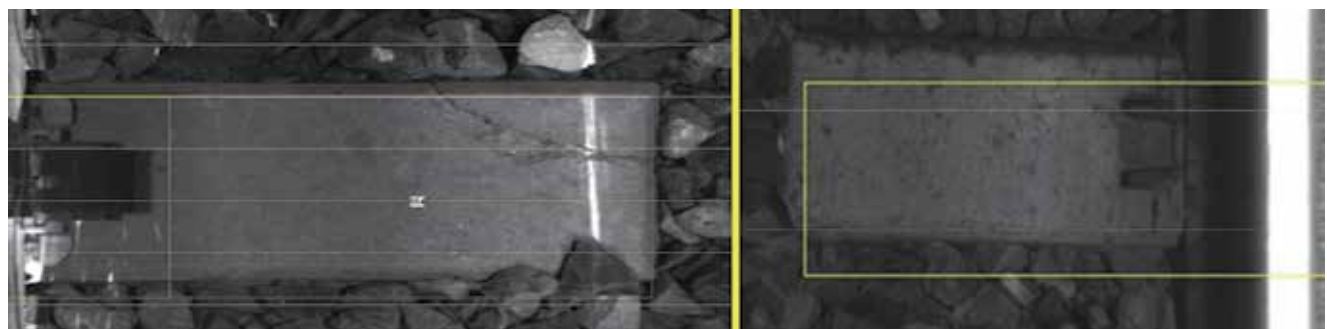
Track surface inspection system – cracked sleeper (left), missing fastener (right) [10]
